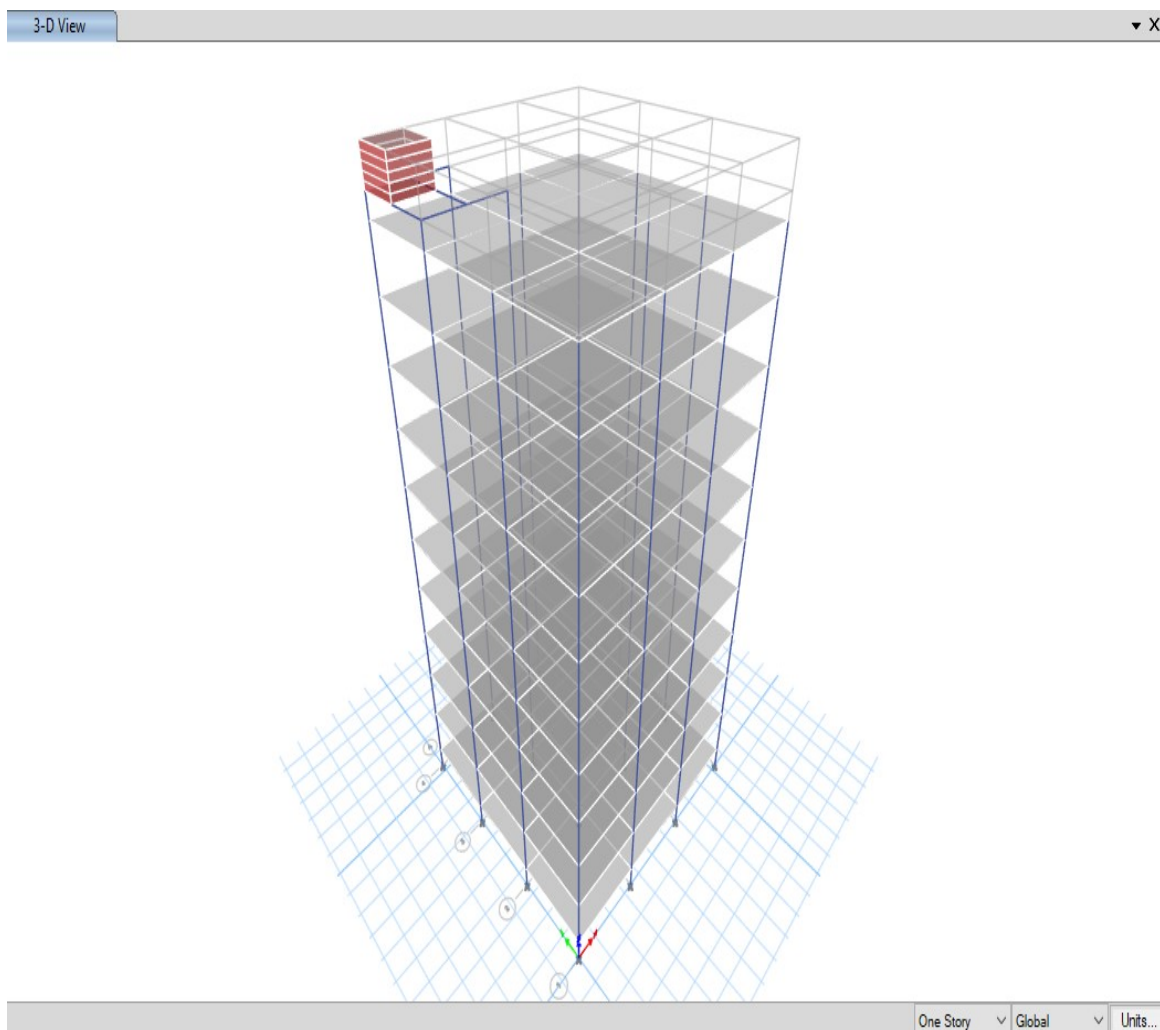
3D view of G+10 Model with Empty, Filled & Half filled water tank
